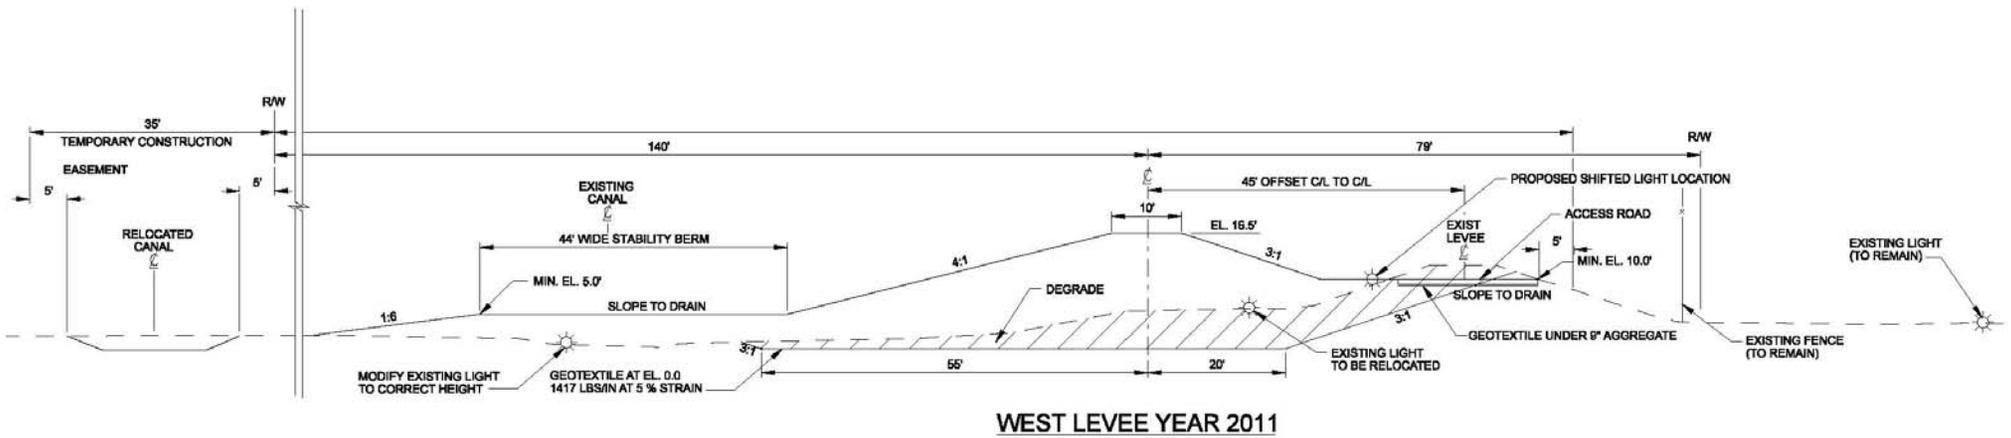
Cross-sectional view of LPV 03d showing the existing and proposed levee centerlines and the approved (in IER 1) and proposed ROW (approx. 2.5 acres).
